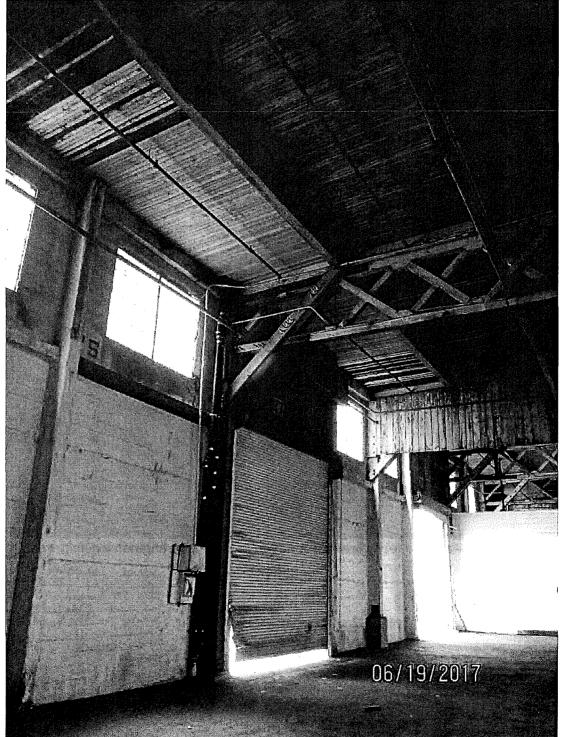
Replacement truss column and strengthened truss connections installed in 2017
